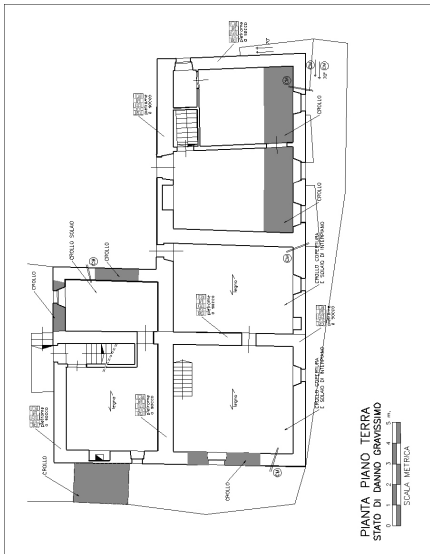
First-floor (ground-level) plan illustrating extent of earthquake damage.
